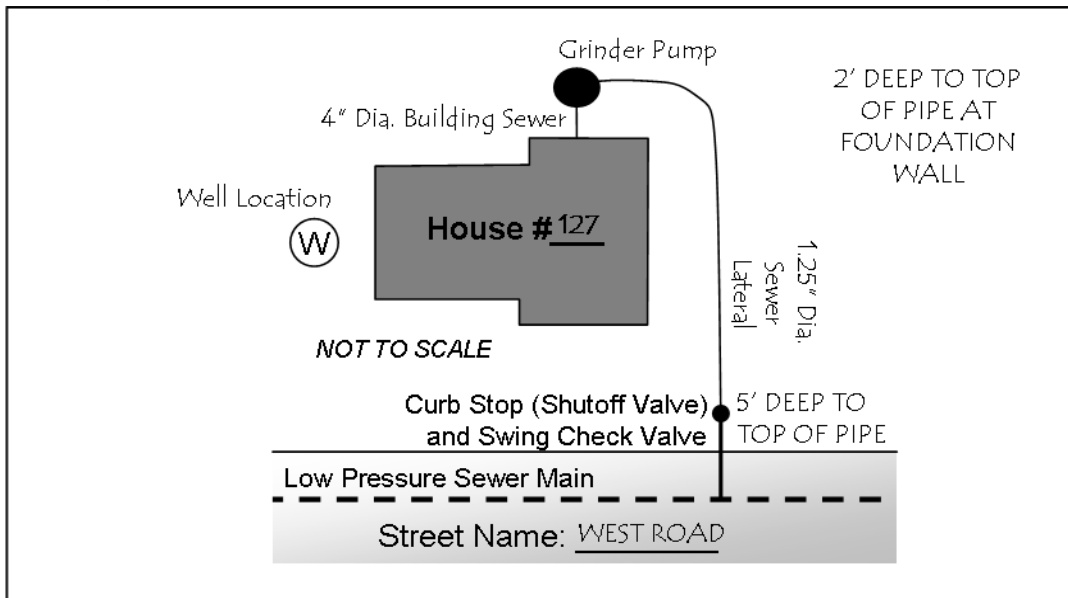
Sample of Proposed Low Pressure Sewer Connection Plan
